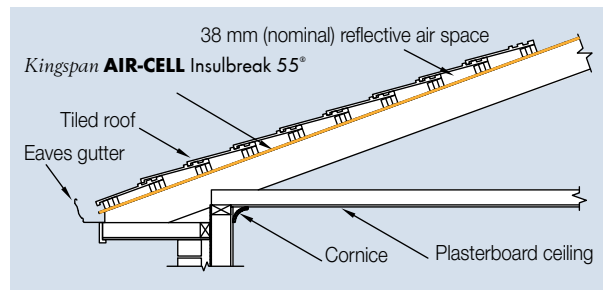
Side elevation of Kingspan AIR-CELL Insulbreak® 55 in a tiled roof with an attic space and a flat ceiling
